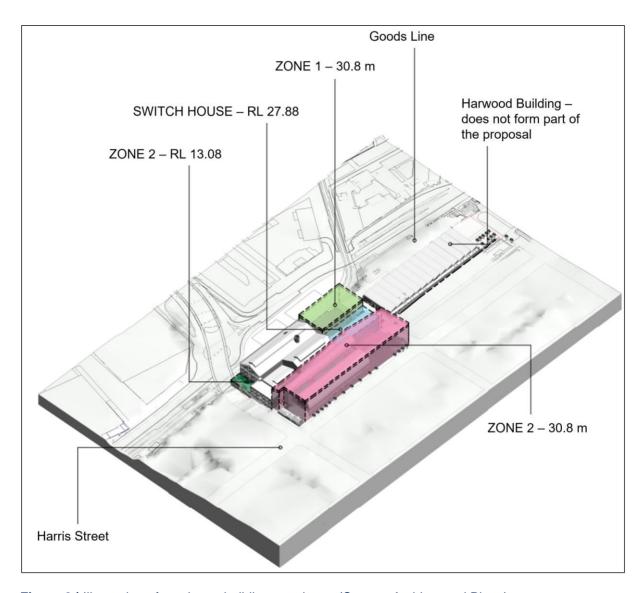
| Illustration of maximum building envelopes (Source: Architectural Plans)
